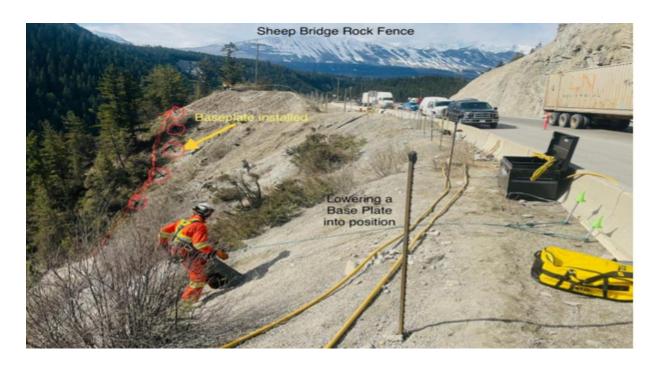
SHEEP BRIDGE POST INSTALLATION OF THE ROCK FENCE
